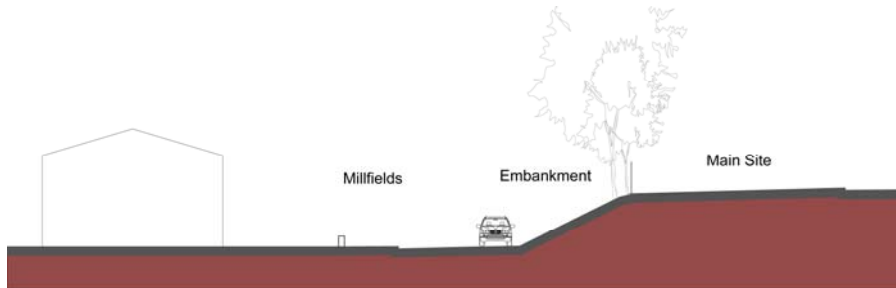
Section through embankment to Millfields at north west corner of Main Site
